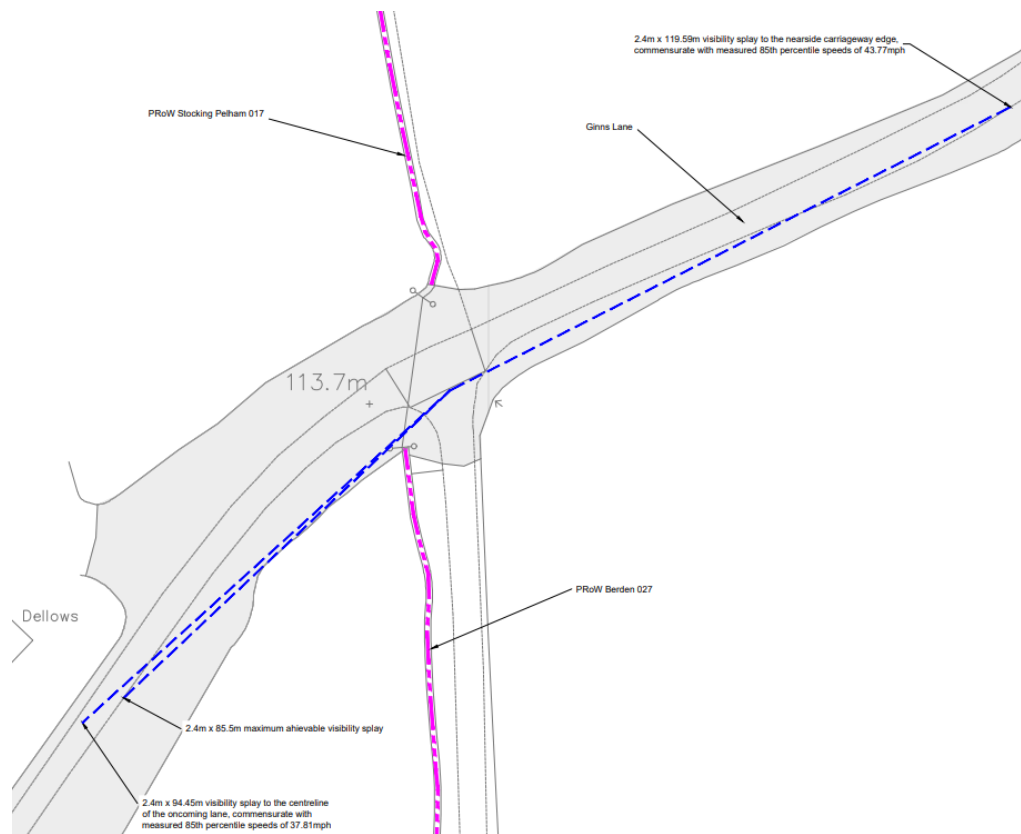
Extract of Drawing Ref: 'Figure 3.4' of the supporting Construction Management Traffic Plan confirming the sight spays.
